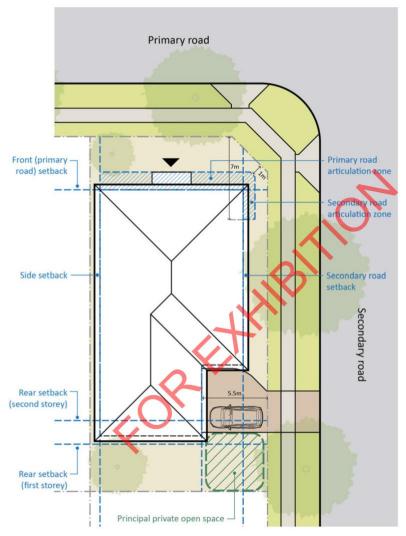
Setbacks and articulation zones for a dwelling house on a corner lot
